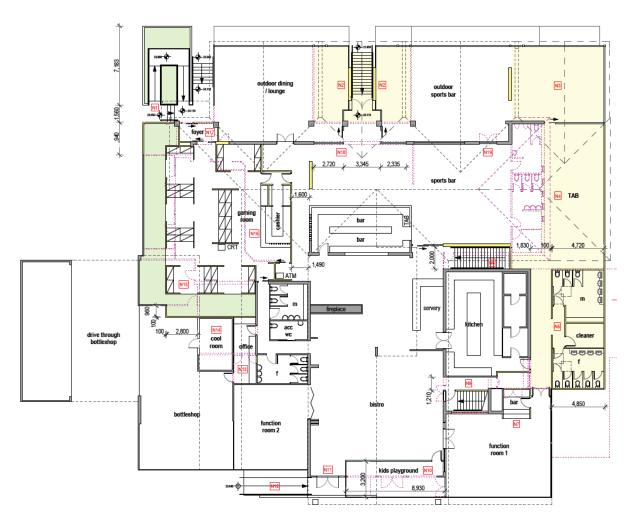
Ground floor plan of the Tavern for works approved under DA/2020/520 (Source: Darren Mah Design; dated 8 Jul 2020)
